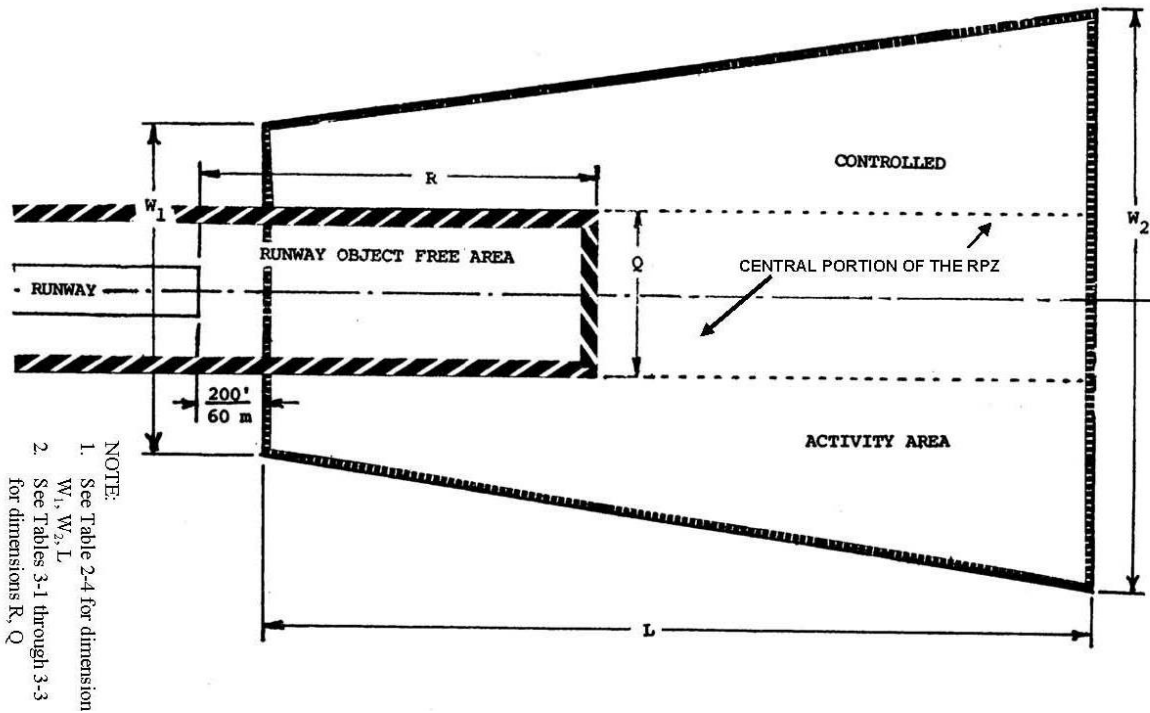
PLAN VIEW OF RUNWAY PROTECTION ZONE
